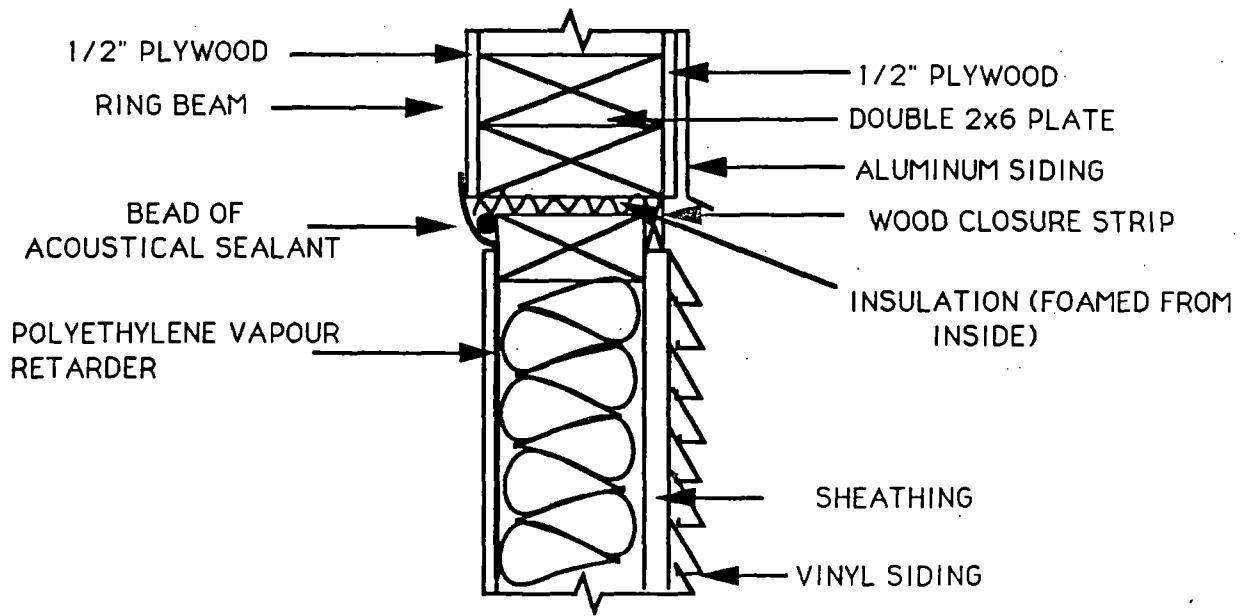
TOP PLATE CONSTRUCTION DETAIL
